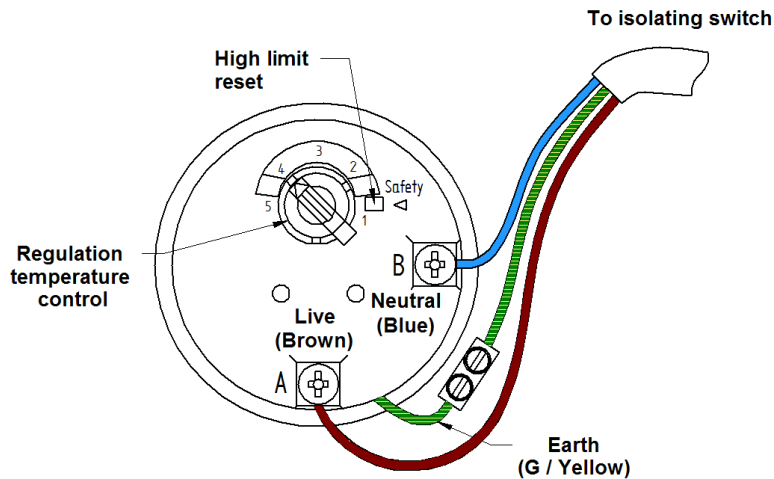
Bottom Immersion Heater Wiring (Direct Only)
